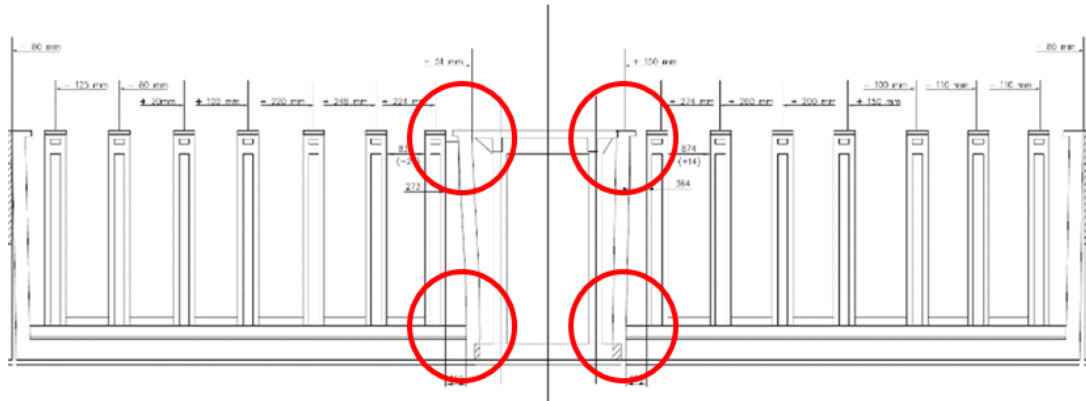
Cross section of ABF furnace. Location of main structural defects observed on concrete casing
